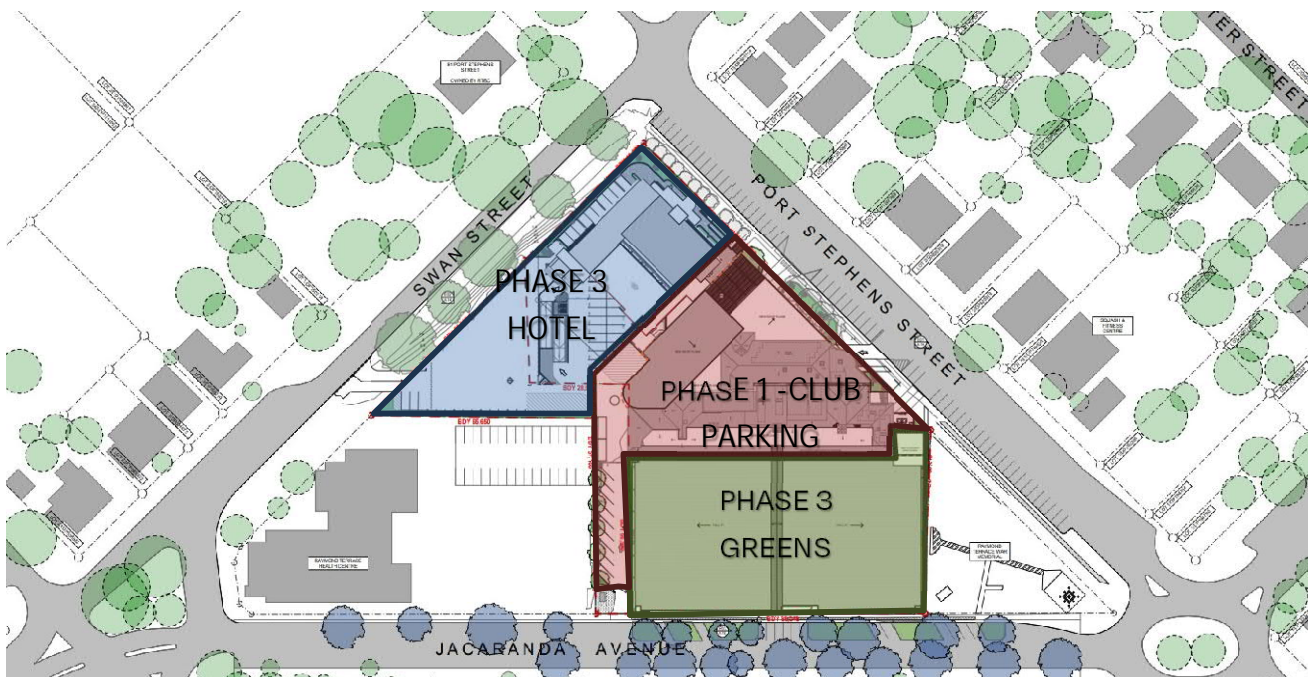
Site plan showing extent of site and proposed works. N.b. North is to the right of the image – source EJE Architecture
